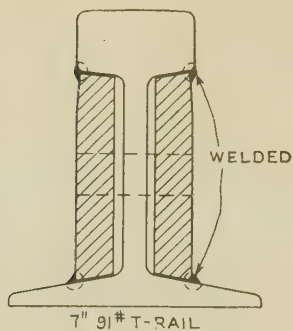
Fish-plate type arc-welded rail joint.
